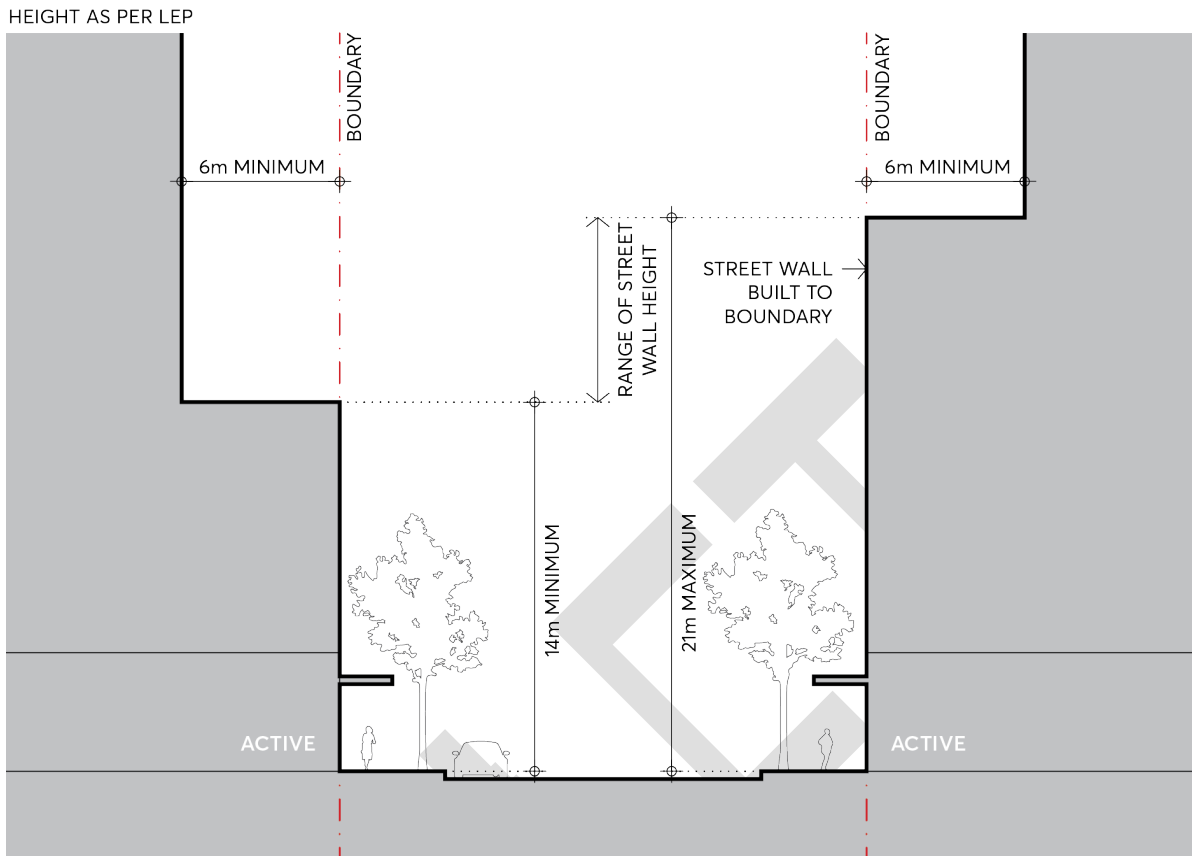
Street Setbacks and Street Wall Height – Active Ground Floor Street Frontage
